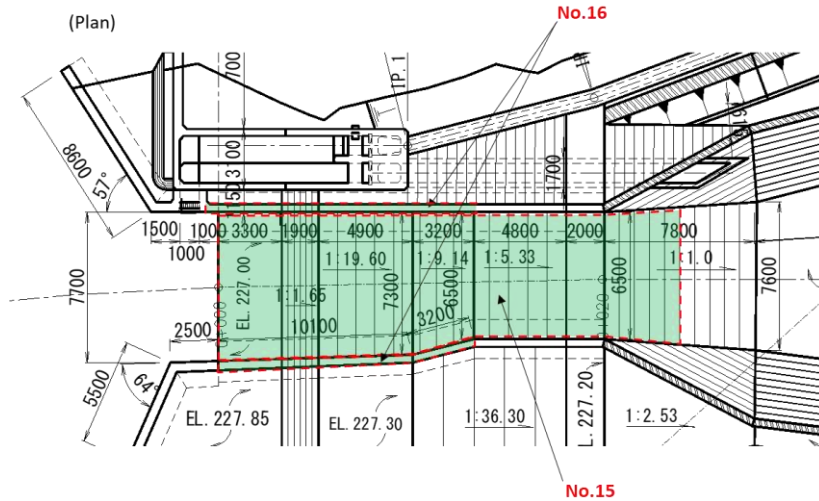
Rehabilitation Plan from No.15 to No.16
